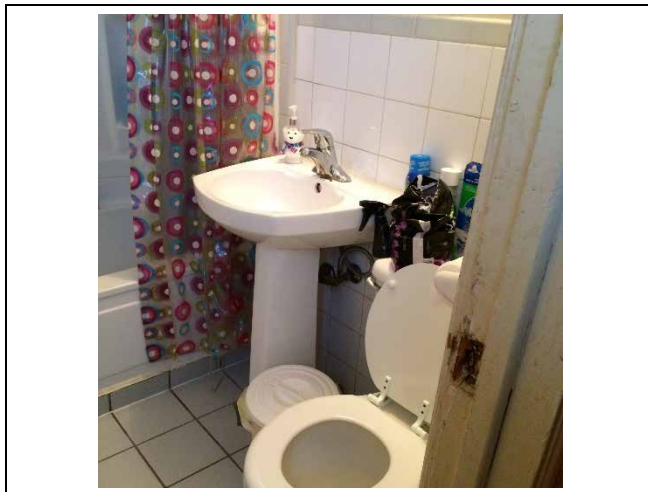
Presumed asbestos-containing ceramic tile grout and mortar/adhesive on walls and floor in the washroom of 116 Brighton Crescent.
